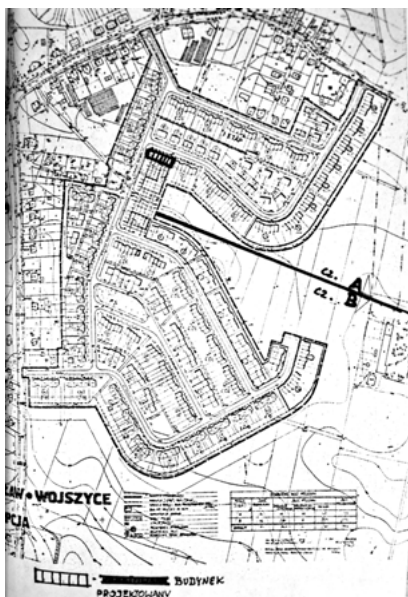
Detailed development plan of single family house settlement in Oporów district, 1974, designer D. Przyłęcka, source: D. Przyłęcka, *Odbudowa i rozwój Wrocławia w planach zagospodarowania przestrzennego z lat 1945 – 1994
